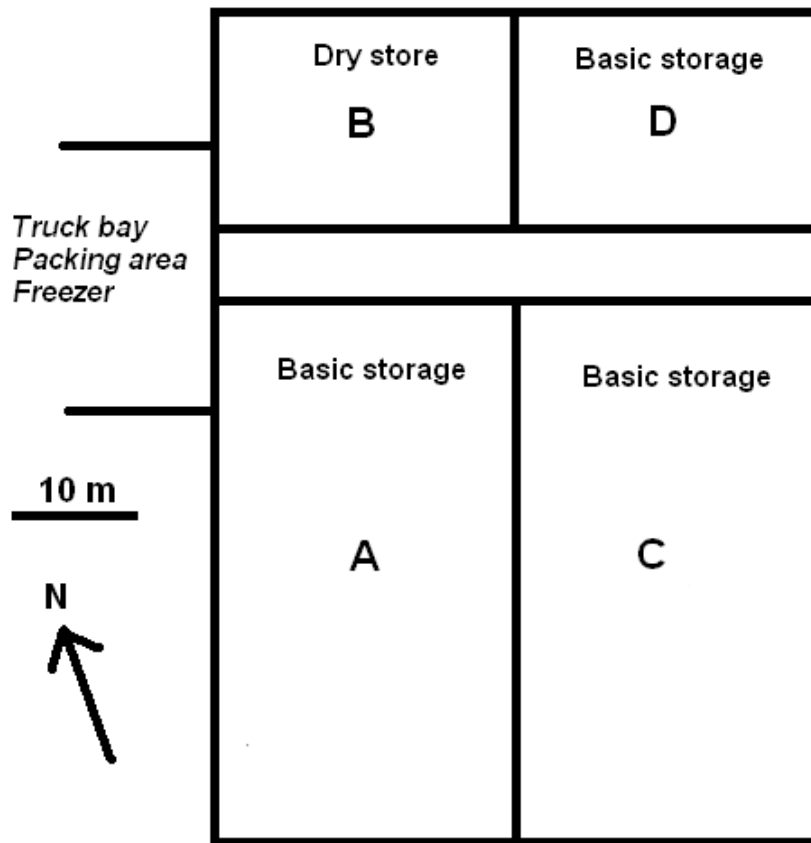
Floor plan (approximately to scale) of storage areas.
